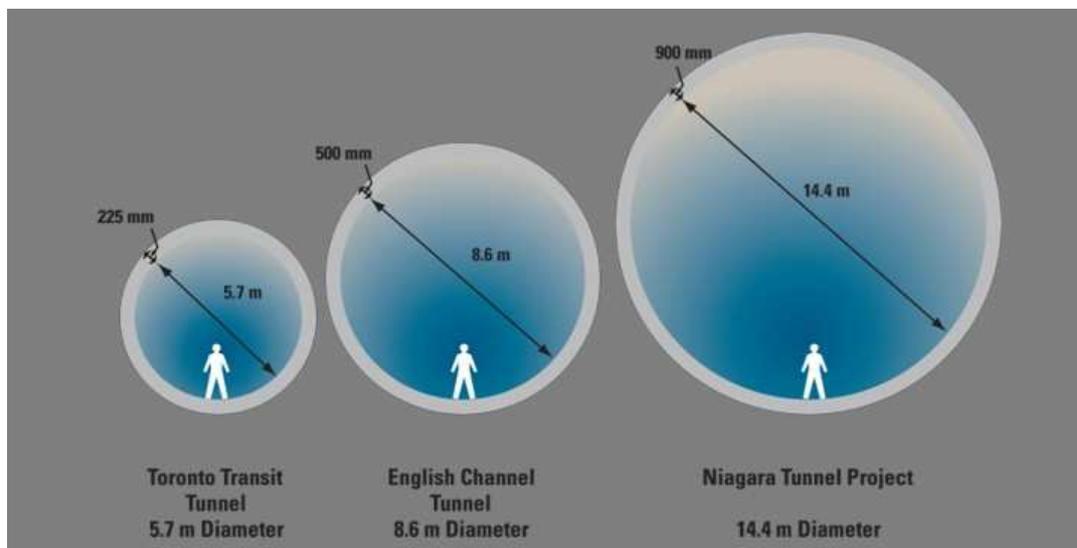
Cross section of the Niagara Tunnel (right) as compared to the cross section of the Toronto Metro (left) and Channel Tunnel (centre).
